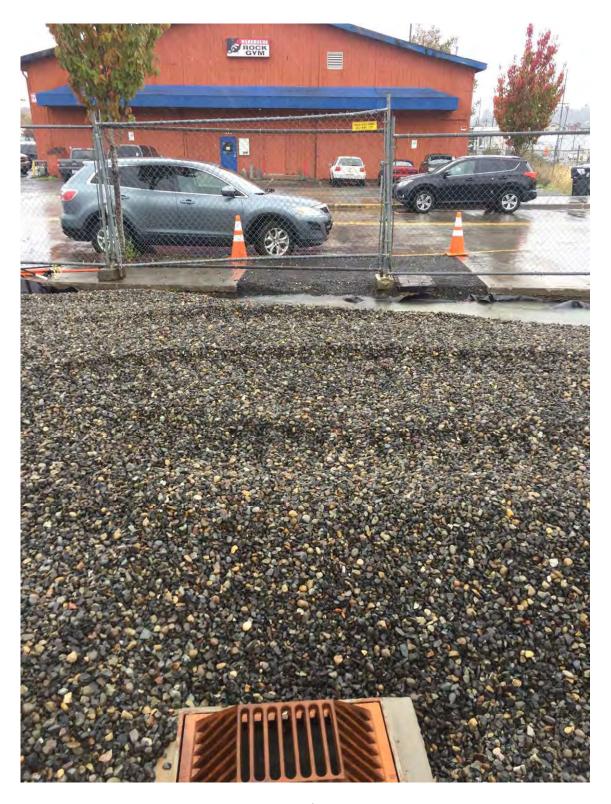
Turbidity Sample Location 2 – Parcel 2/3 – Water inside fence line @ sidewalk Cut on Jefferson Street.
